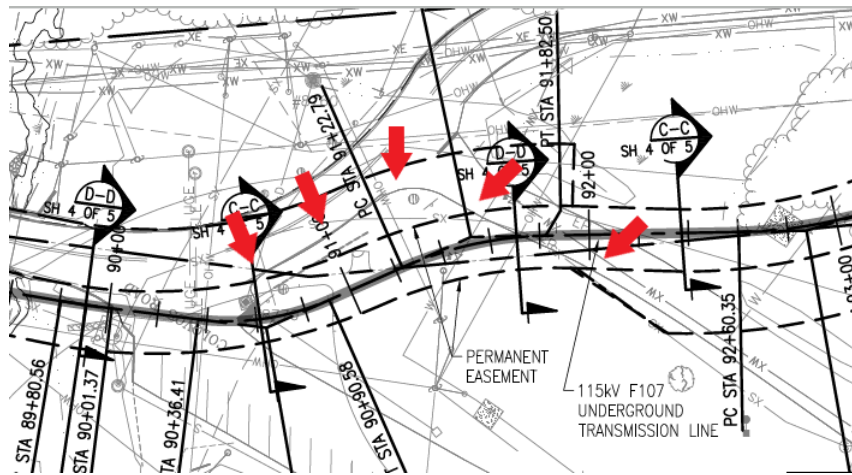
Duct bank plan view where seepage was observed on the Greggs Hall access Road and Waterworks Road
